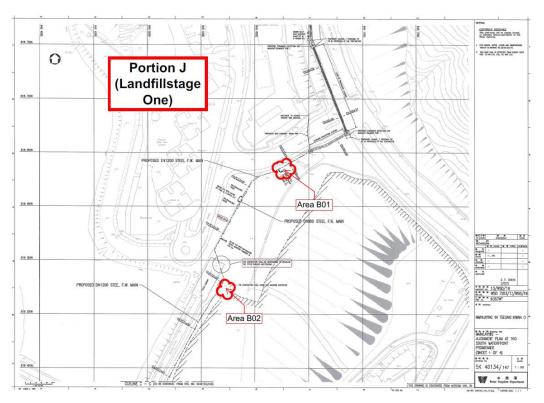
Location Plan - Landfill Stage 1 (Area B01-B02)
